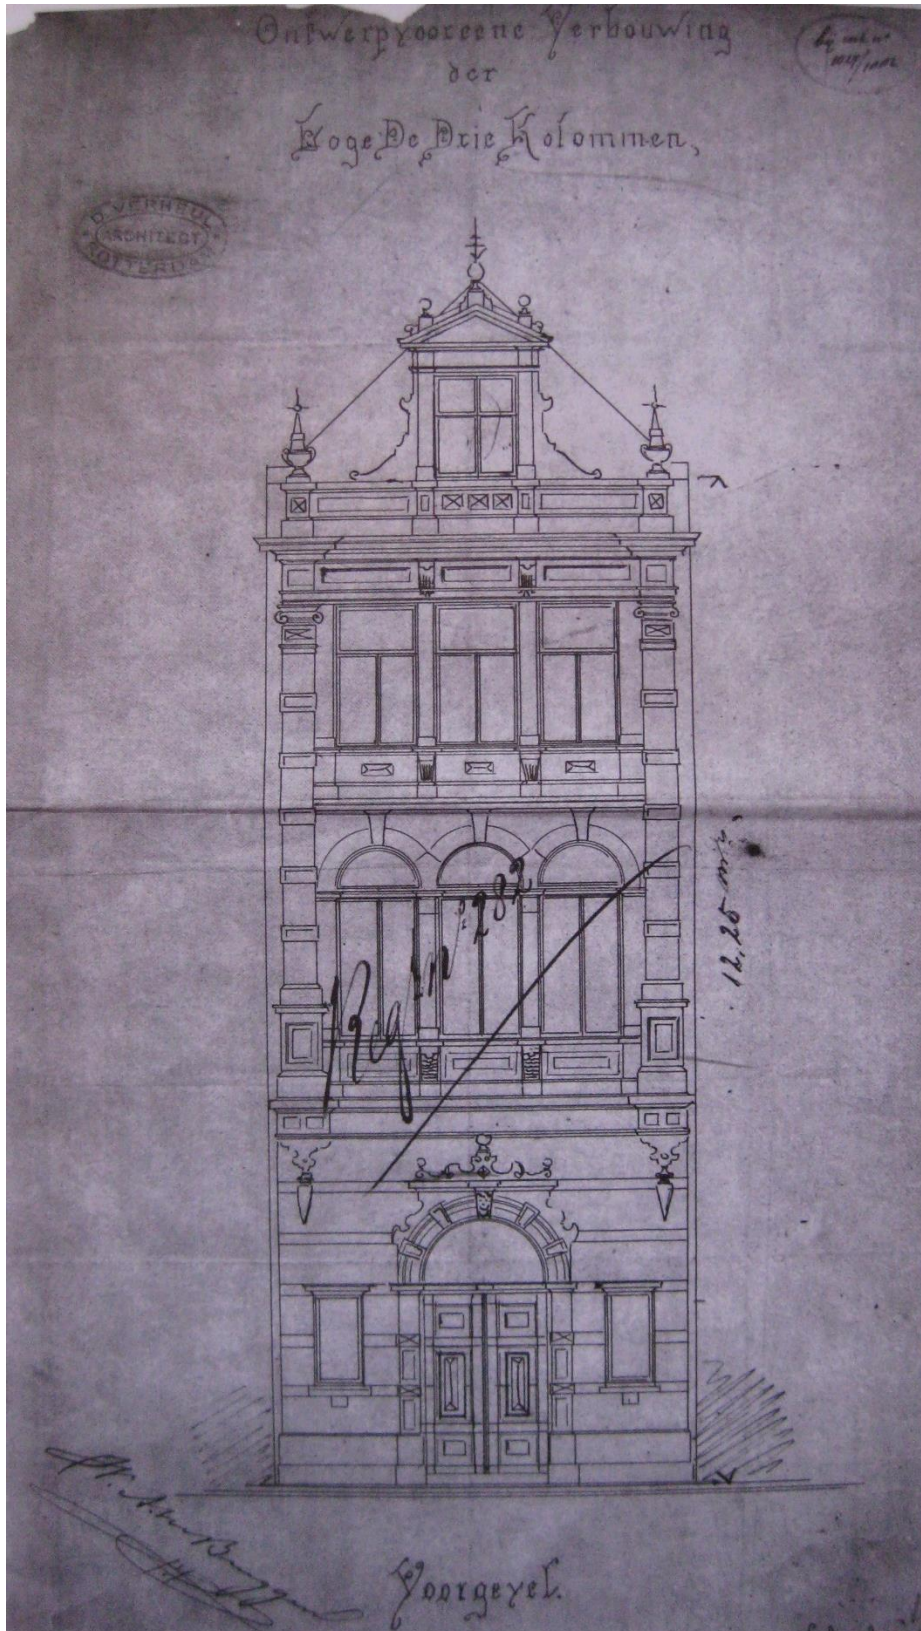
D. Verheul, Facade design for the renovation of Oppert 72 in Rotterdam as lodge building, 1882. Collection: Stadsarchief Rotterdam.
